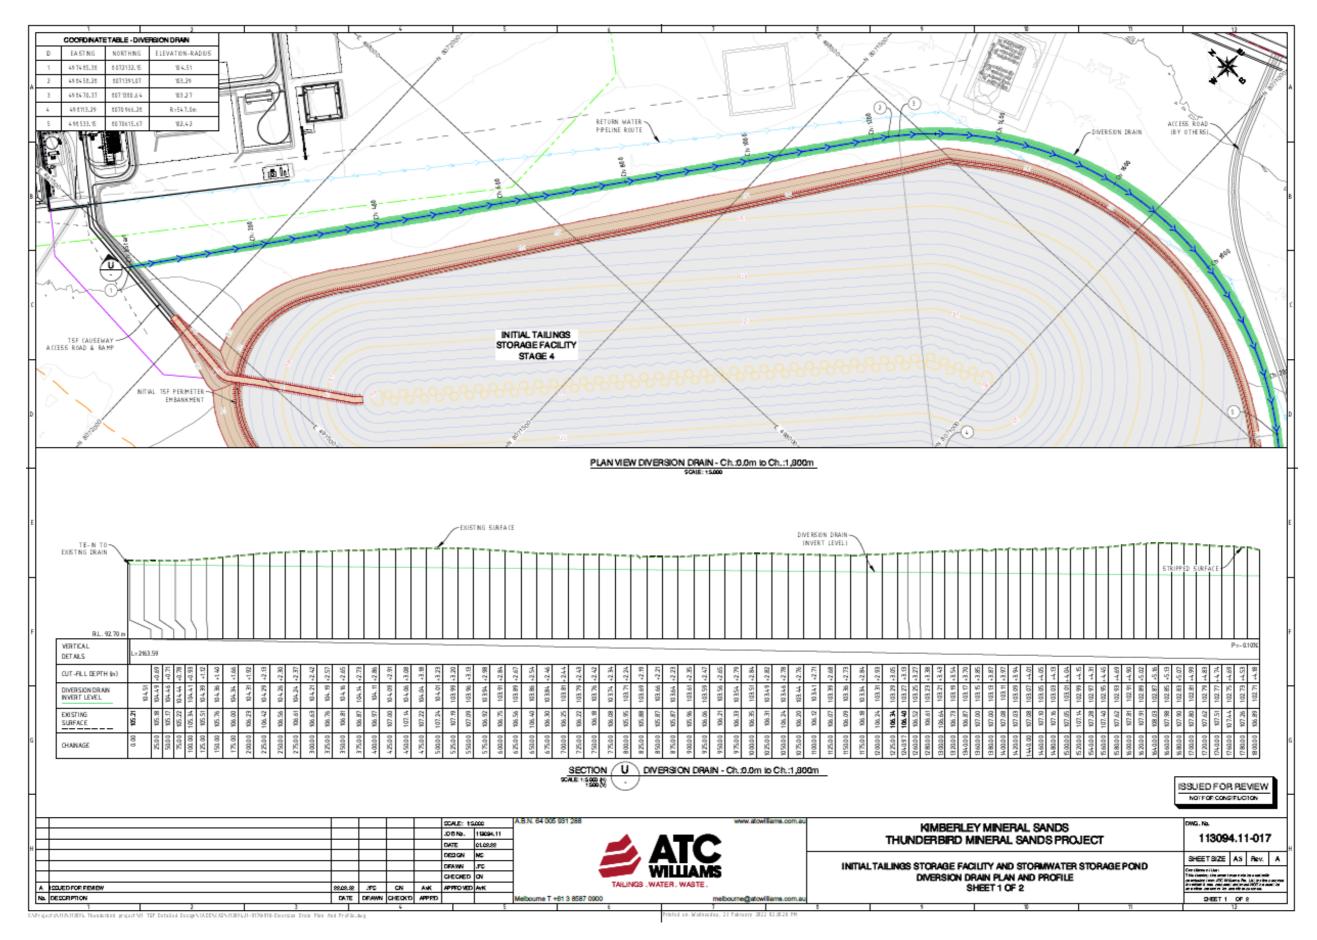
Drawing – Initial TSF and SPP, diversion drain plan and profile (1)
